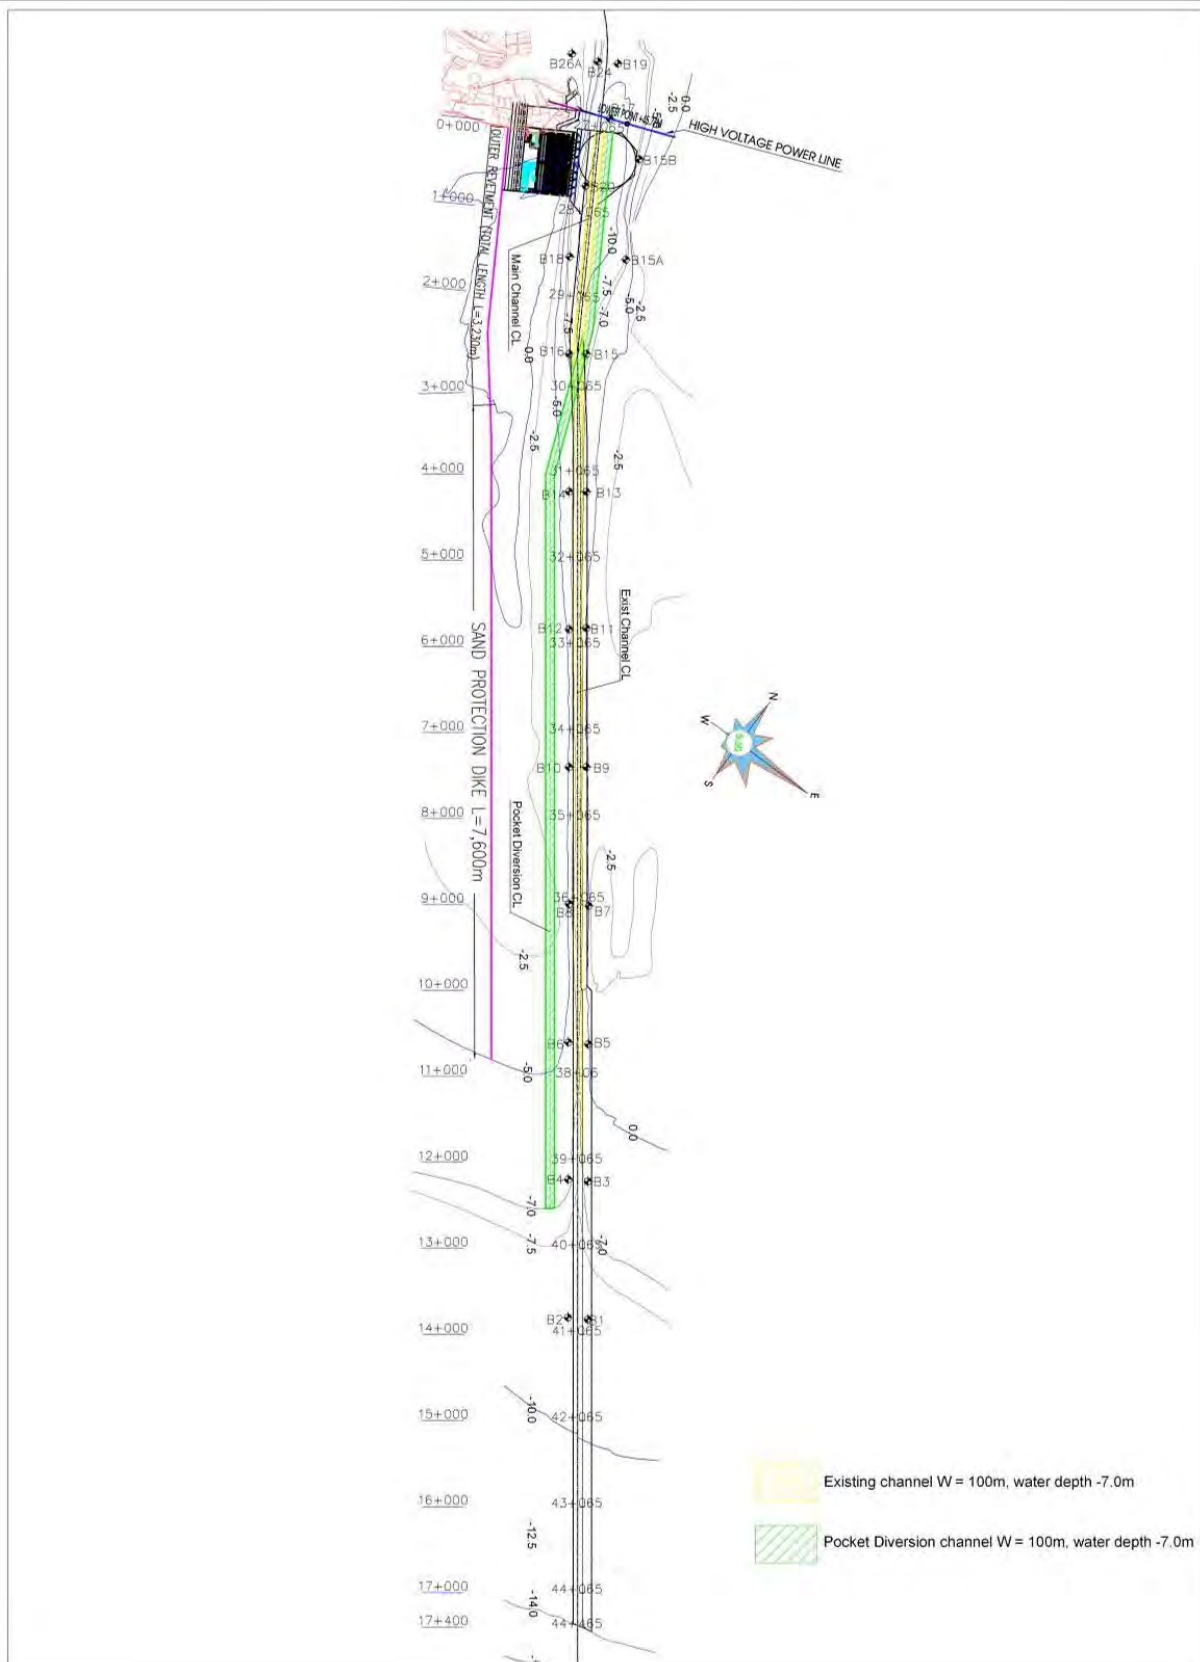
Alternative Case 18 General Layout Plan of West Side Pocket Diversion Channel
